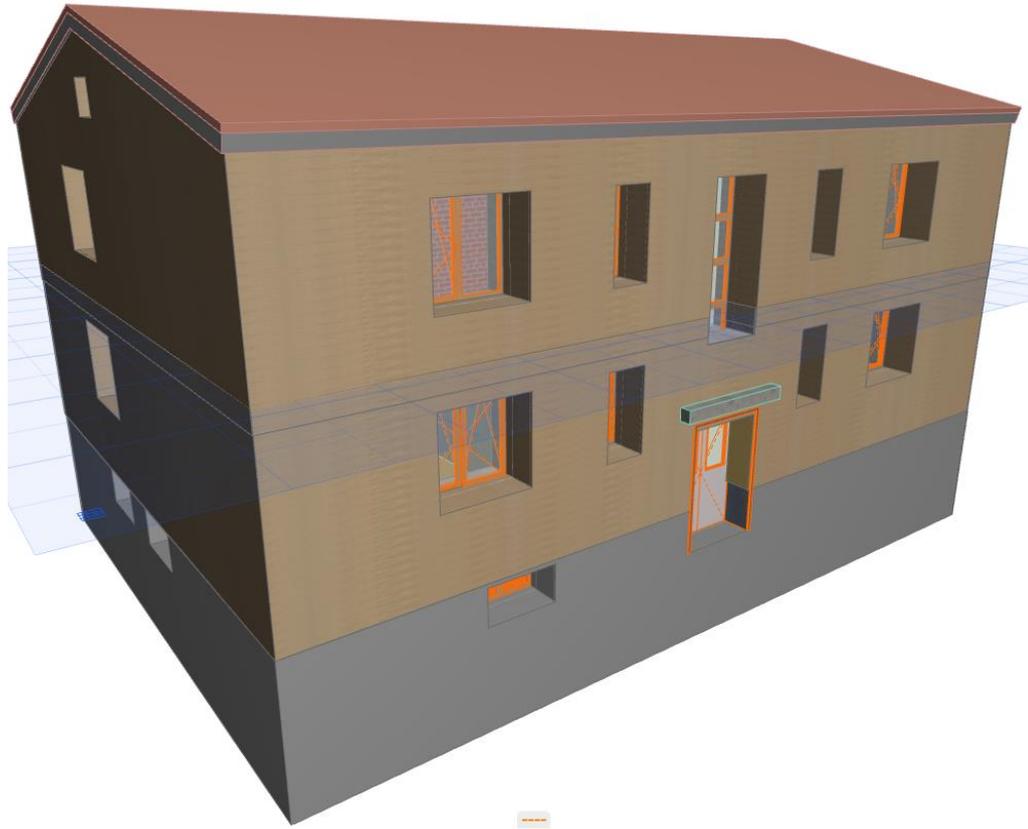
Visualization of the building insulated with 463 mm thick wood panel including 40 mm air space separating existing wall.
